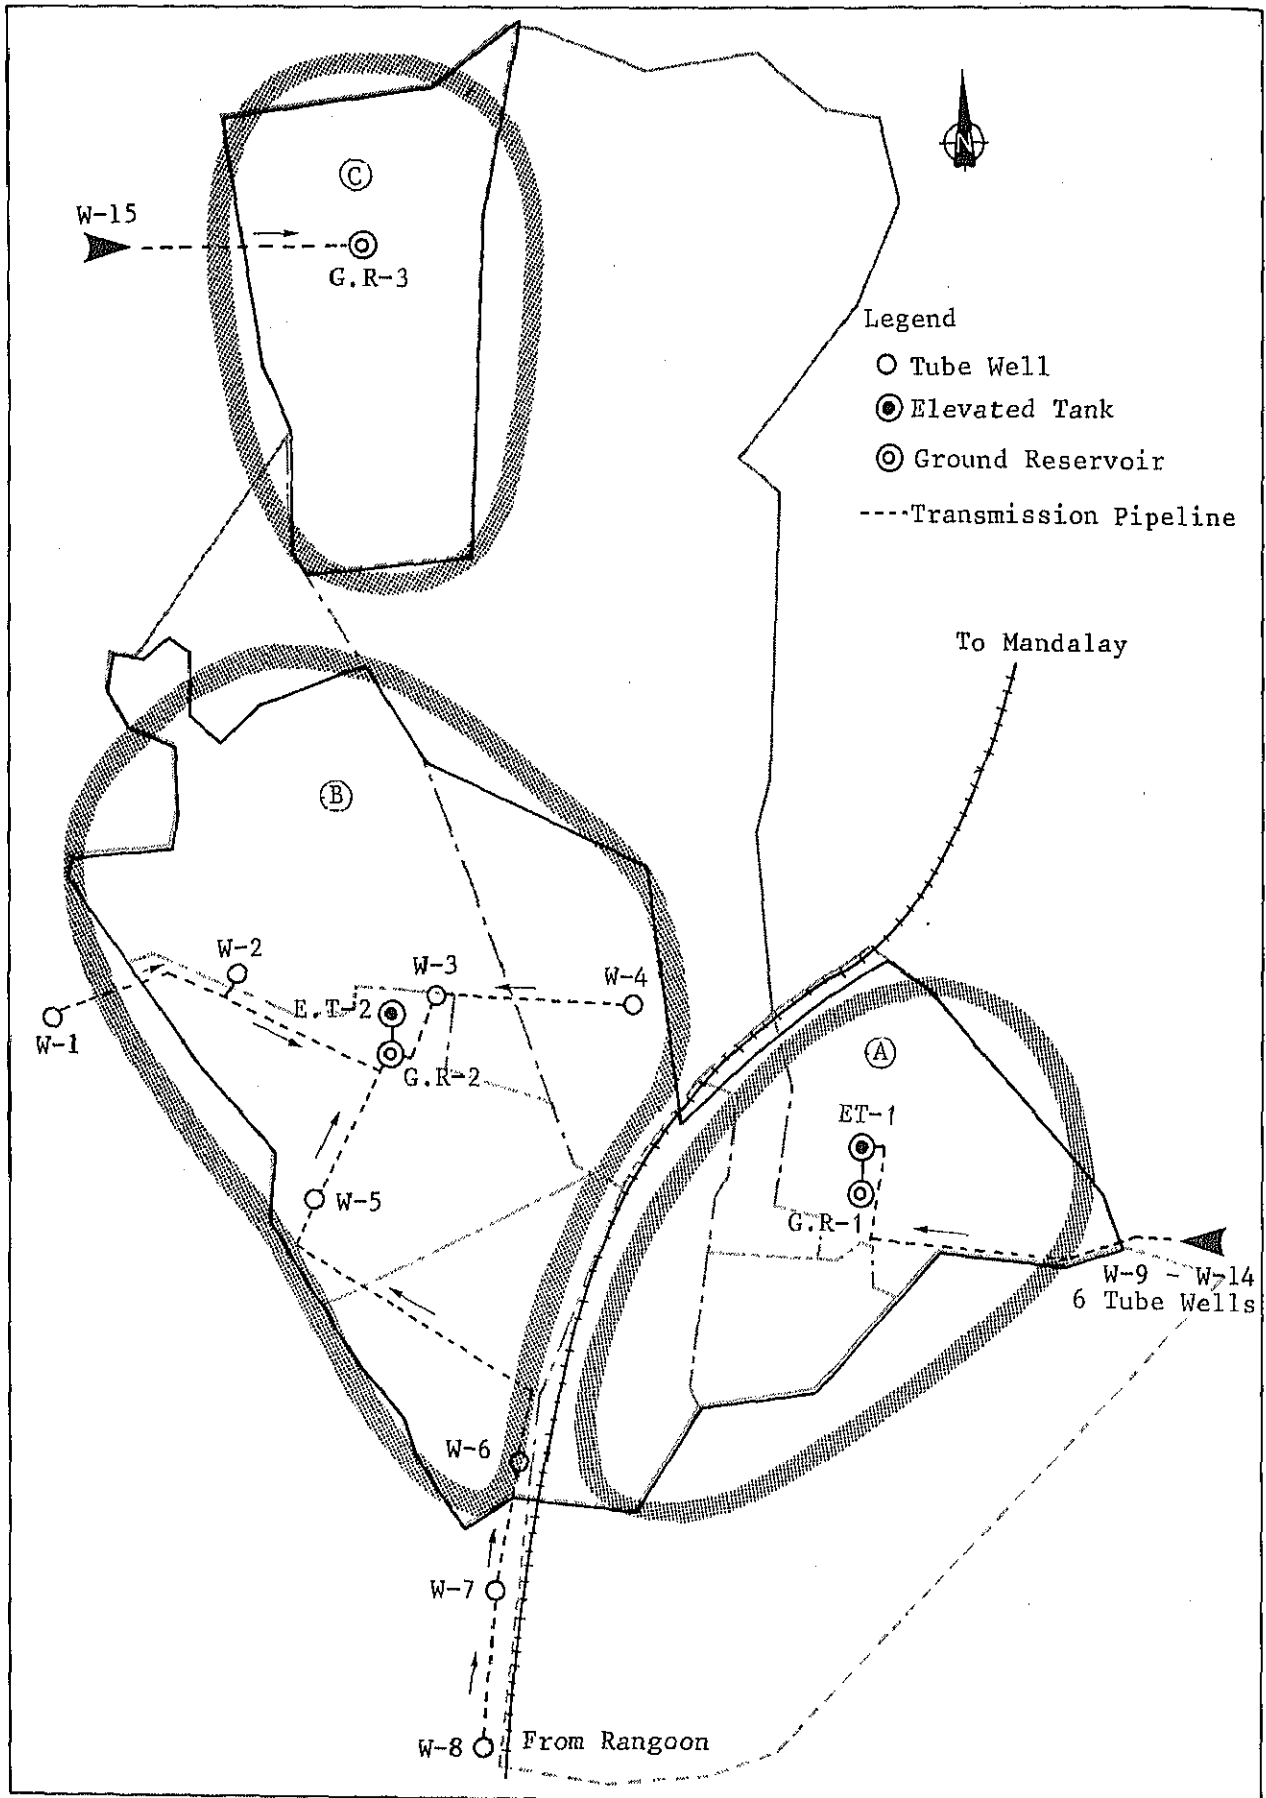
Layout Plan of Proposed Facilities
